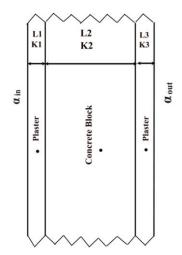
A wall without Insulation Using Concrete Blocks Material Construction
